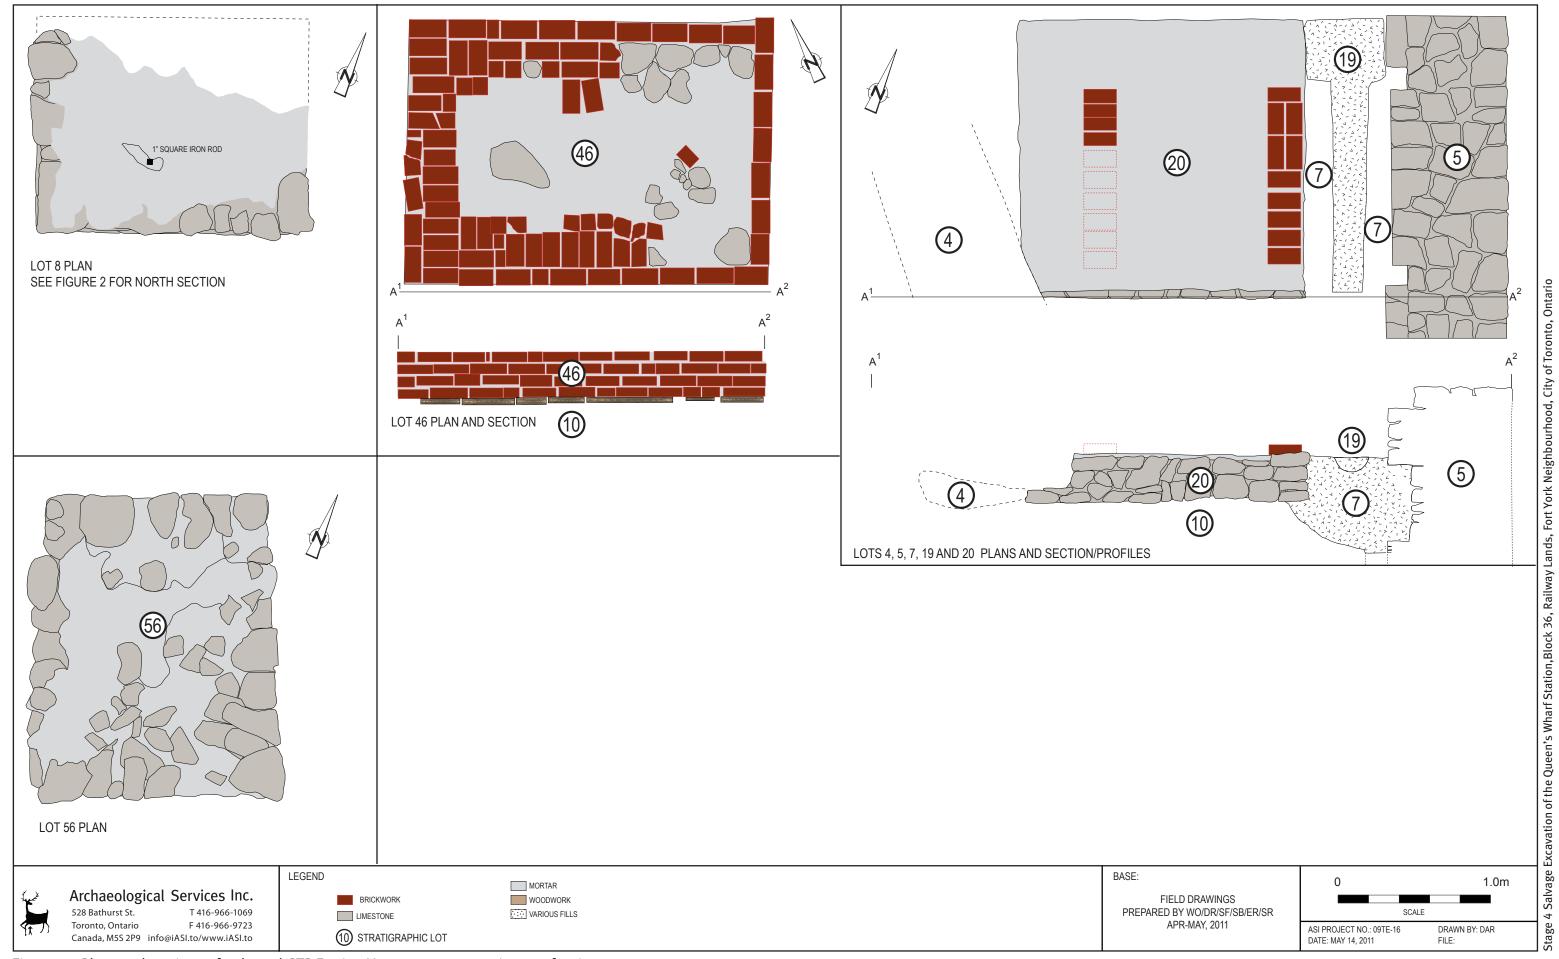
Plans and sections of selected GTR Engine House masonry equipment footings.
